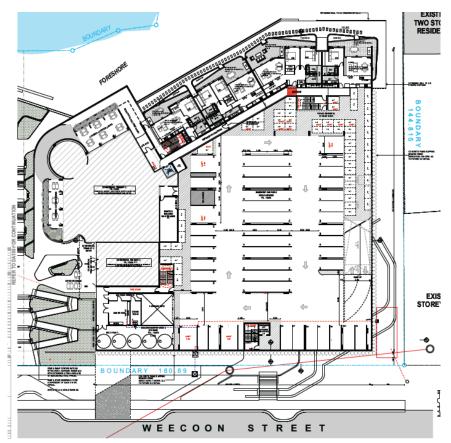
PROPOSED FIRST FLOOR PLAN:
